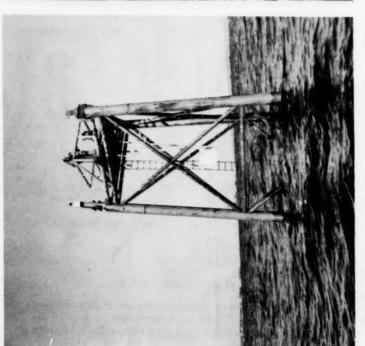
Sea tower, made of prefabricated units consisting of 18 inch pipe for the three legs and 4 to 6 inch pipe bracing, was set on bottom by derrick and secured by driving 10 inch steel pipes to firm bearing inside the 18 inch pipes.
